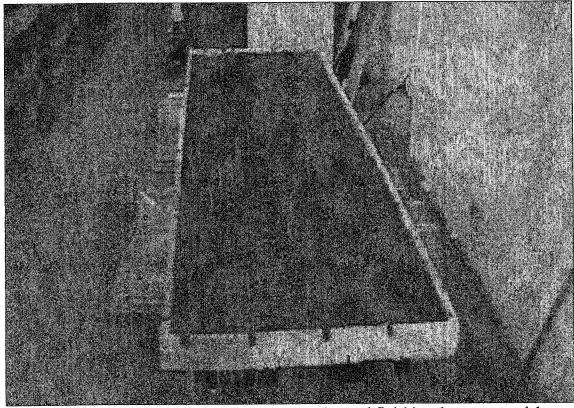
View of Bridge Model M3 after pouring and finishing the concrete slab
